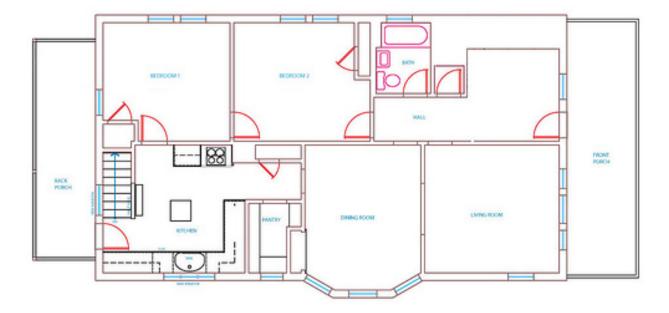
The floor plan of the first story of a house. Architects document their designs using such floor plans.
